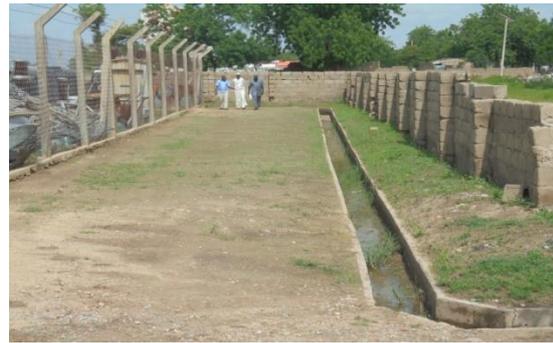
Drainage system around switch yard and concrete block showing one of the areas under dispute
